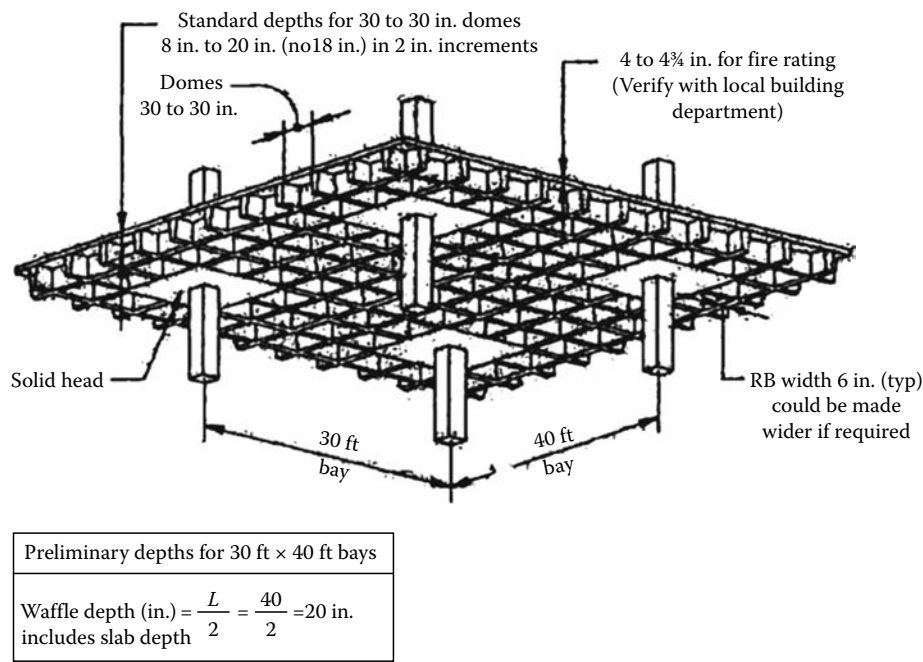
Waffle slab (two-way joist) system 30 ft  $\times$  40 ft bays.
